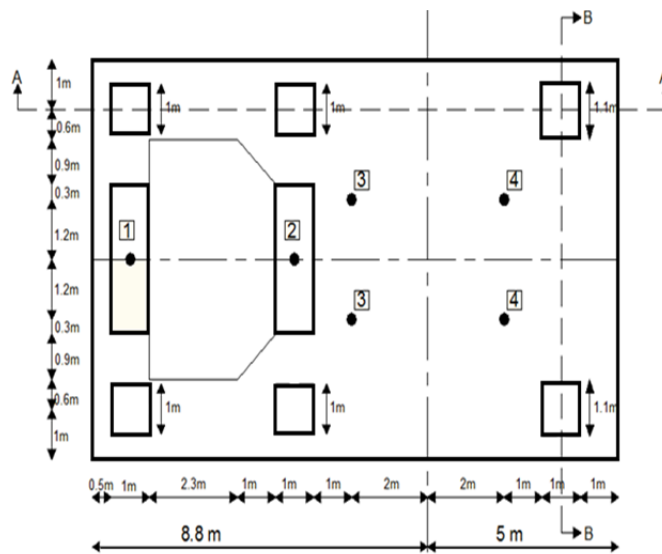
Plan of the Turbo Generator Foundation showing the bearing locations of the Machine
